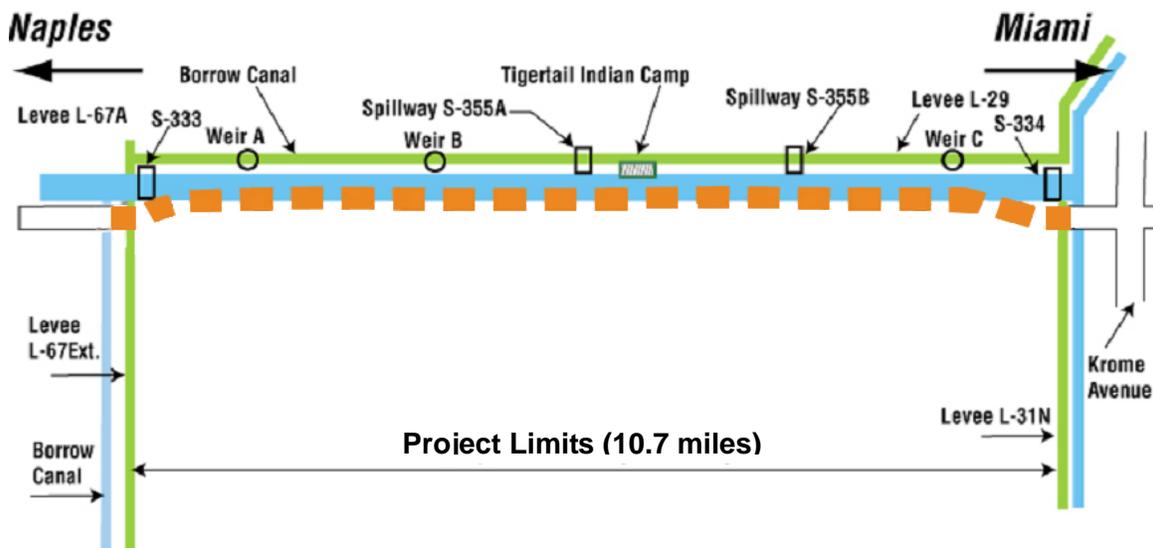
Plan view of Alternative 4 (Elevated Highway), with full fill removal of the Tamiami Trail.
